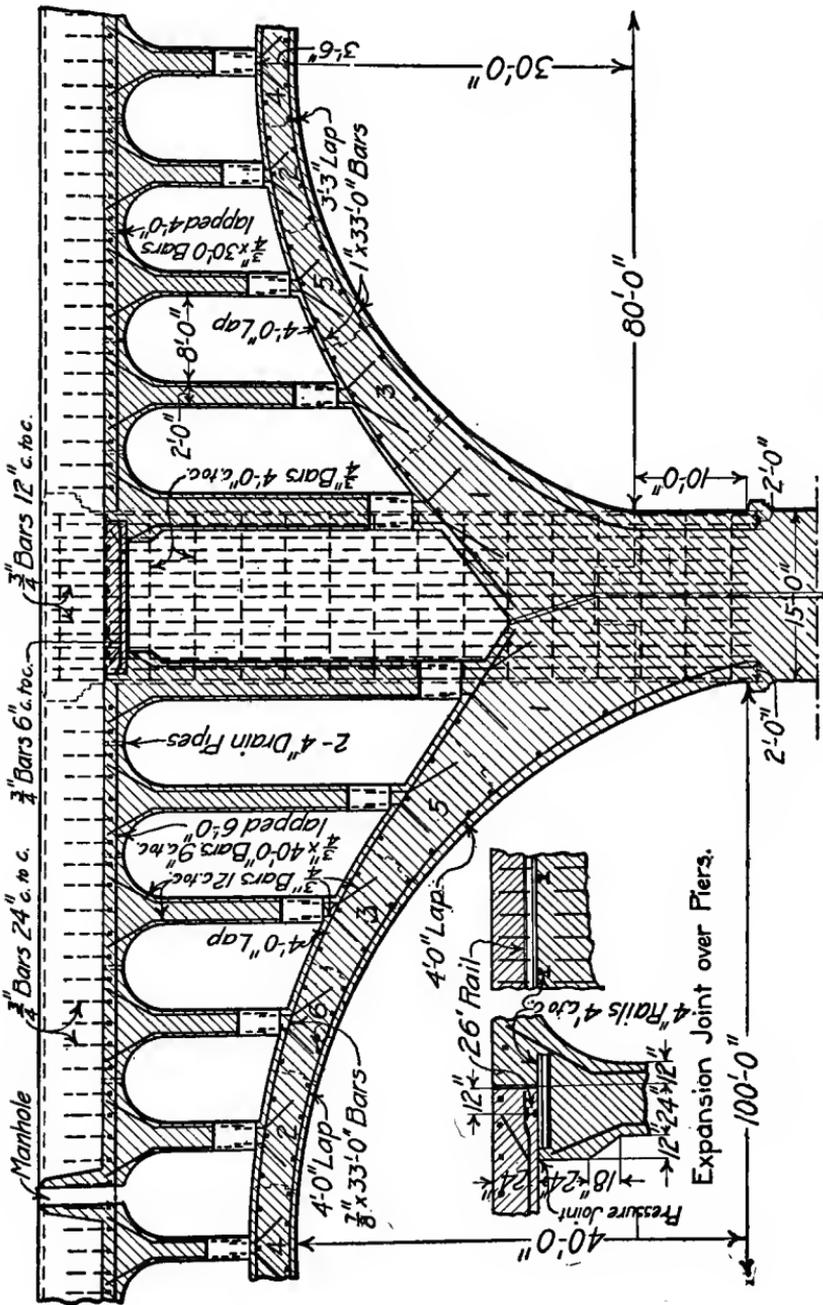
REINFORCED CONCRETE ARCH BRIDGE, G. C. C. & ST. L. R.R., NEAR DANVILLE, ILL.
